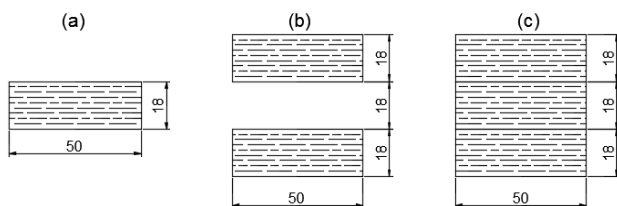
Dimensions of gridshell layers, (a) single layer, (b) double layer without shear blocks, and (c) double layer with shear blocks
